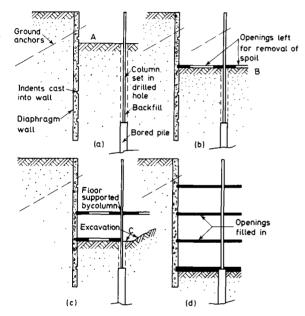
Construction of deep basement. (a) Excavation to level A and ground anchors installed; (b) excavation to level B and floor slab cast; (c) excavation to level C and further floor slab cast; (d) completed excavation with all basement floor slabs cast
